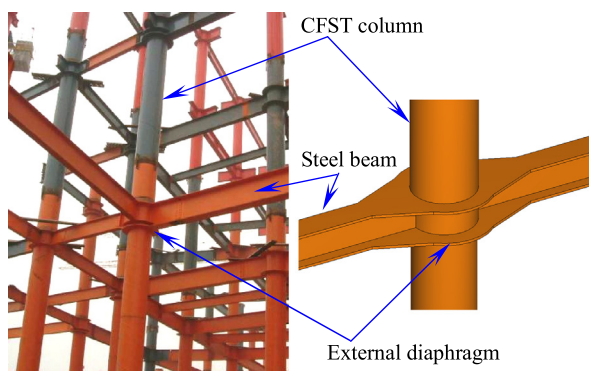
CFST column to steel beam joint with external diaphragm connection.
